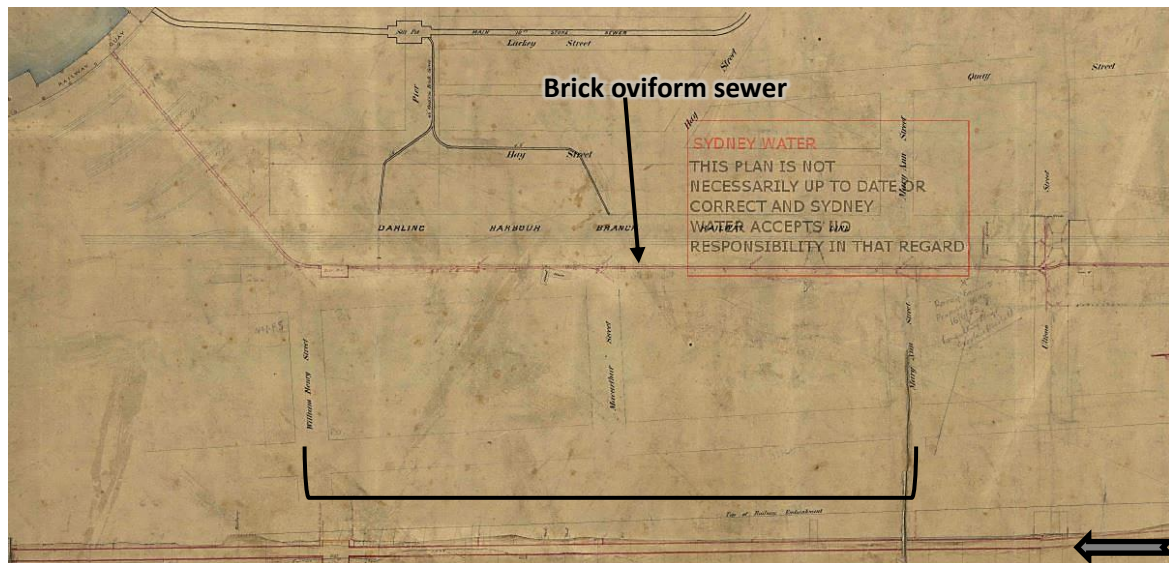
Detail from Sydney Water plan of the Devonshire St to Darling Harbour, dated 1880. The section between Mary Ann and William Henry Streets is bracketed (Archive plan 0089123).
